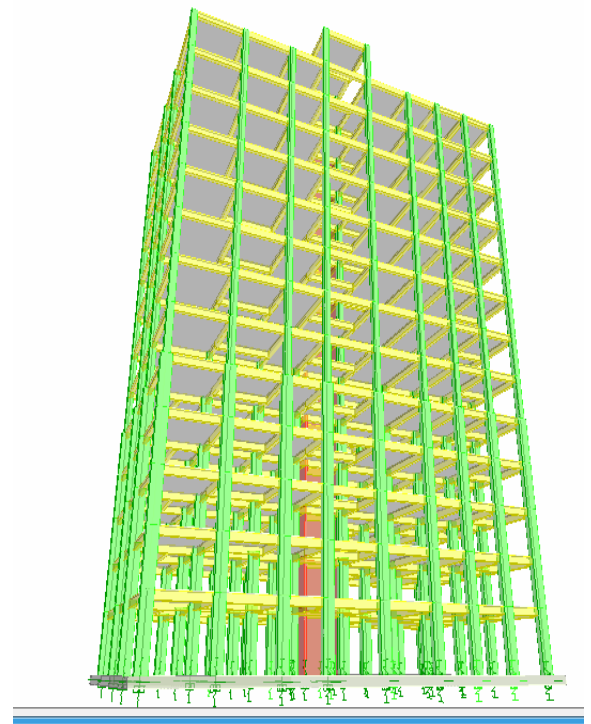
3D rendering view of building with raft foundation and applied soil springs in ETABS
